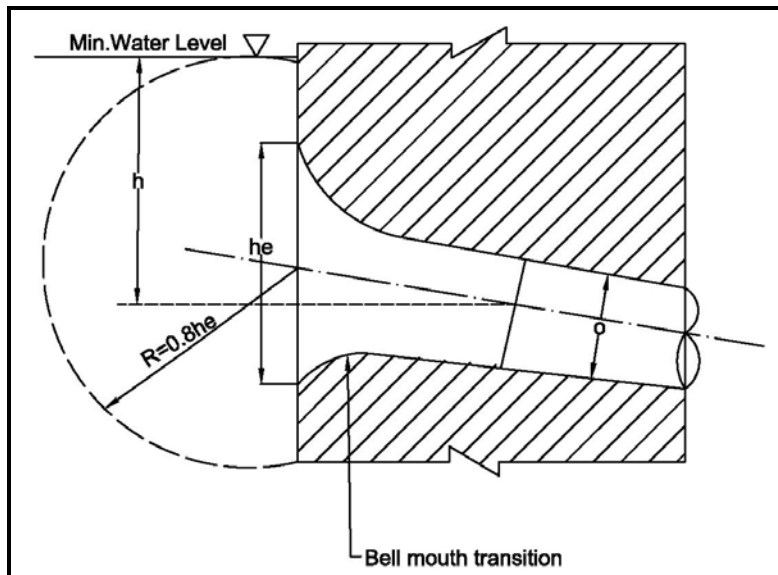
Sub-mergence Requirement of Pressure Conduits
